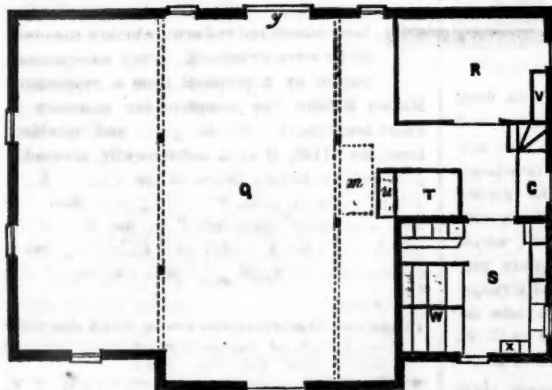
CHAMBER OR SECOND STORY PLAN.
